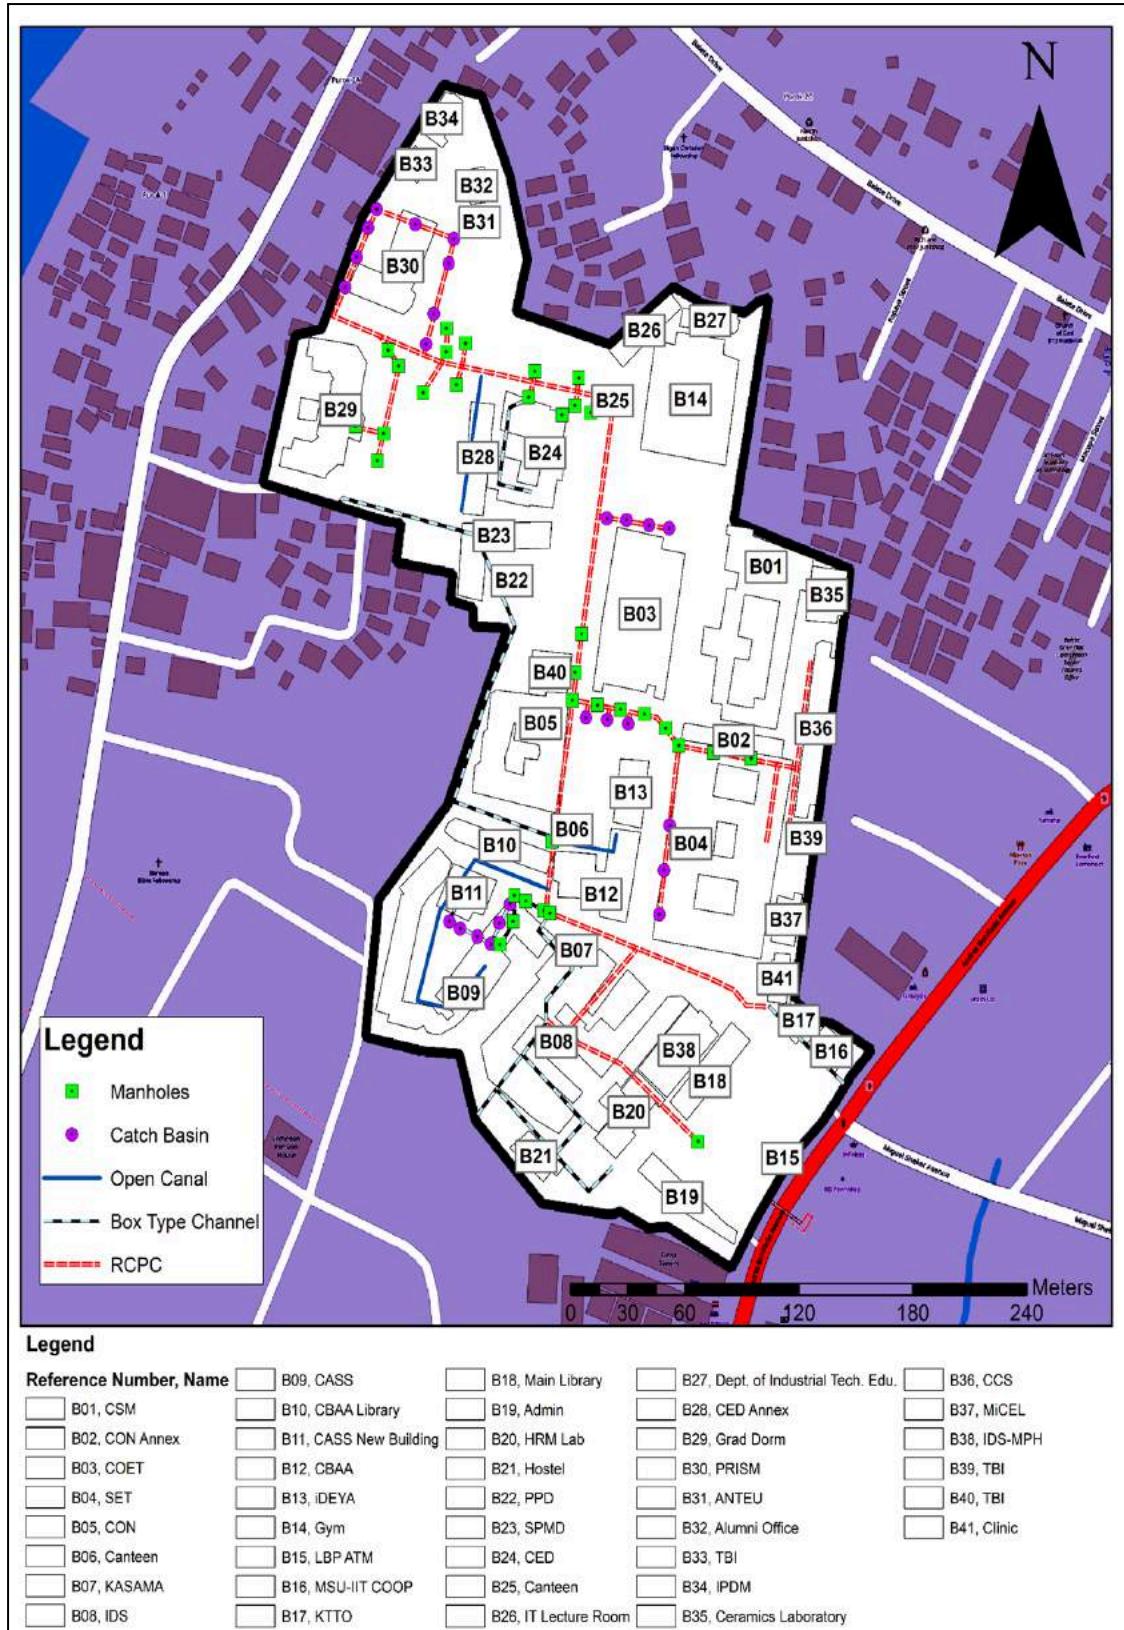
Tibanga Main Campus Existing Drainage Plan (Ali et al., 2023)
